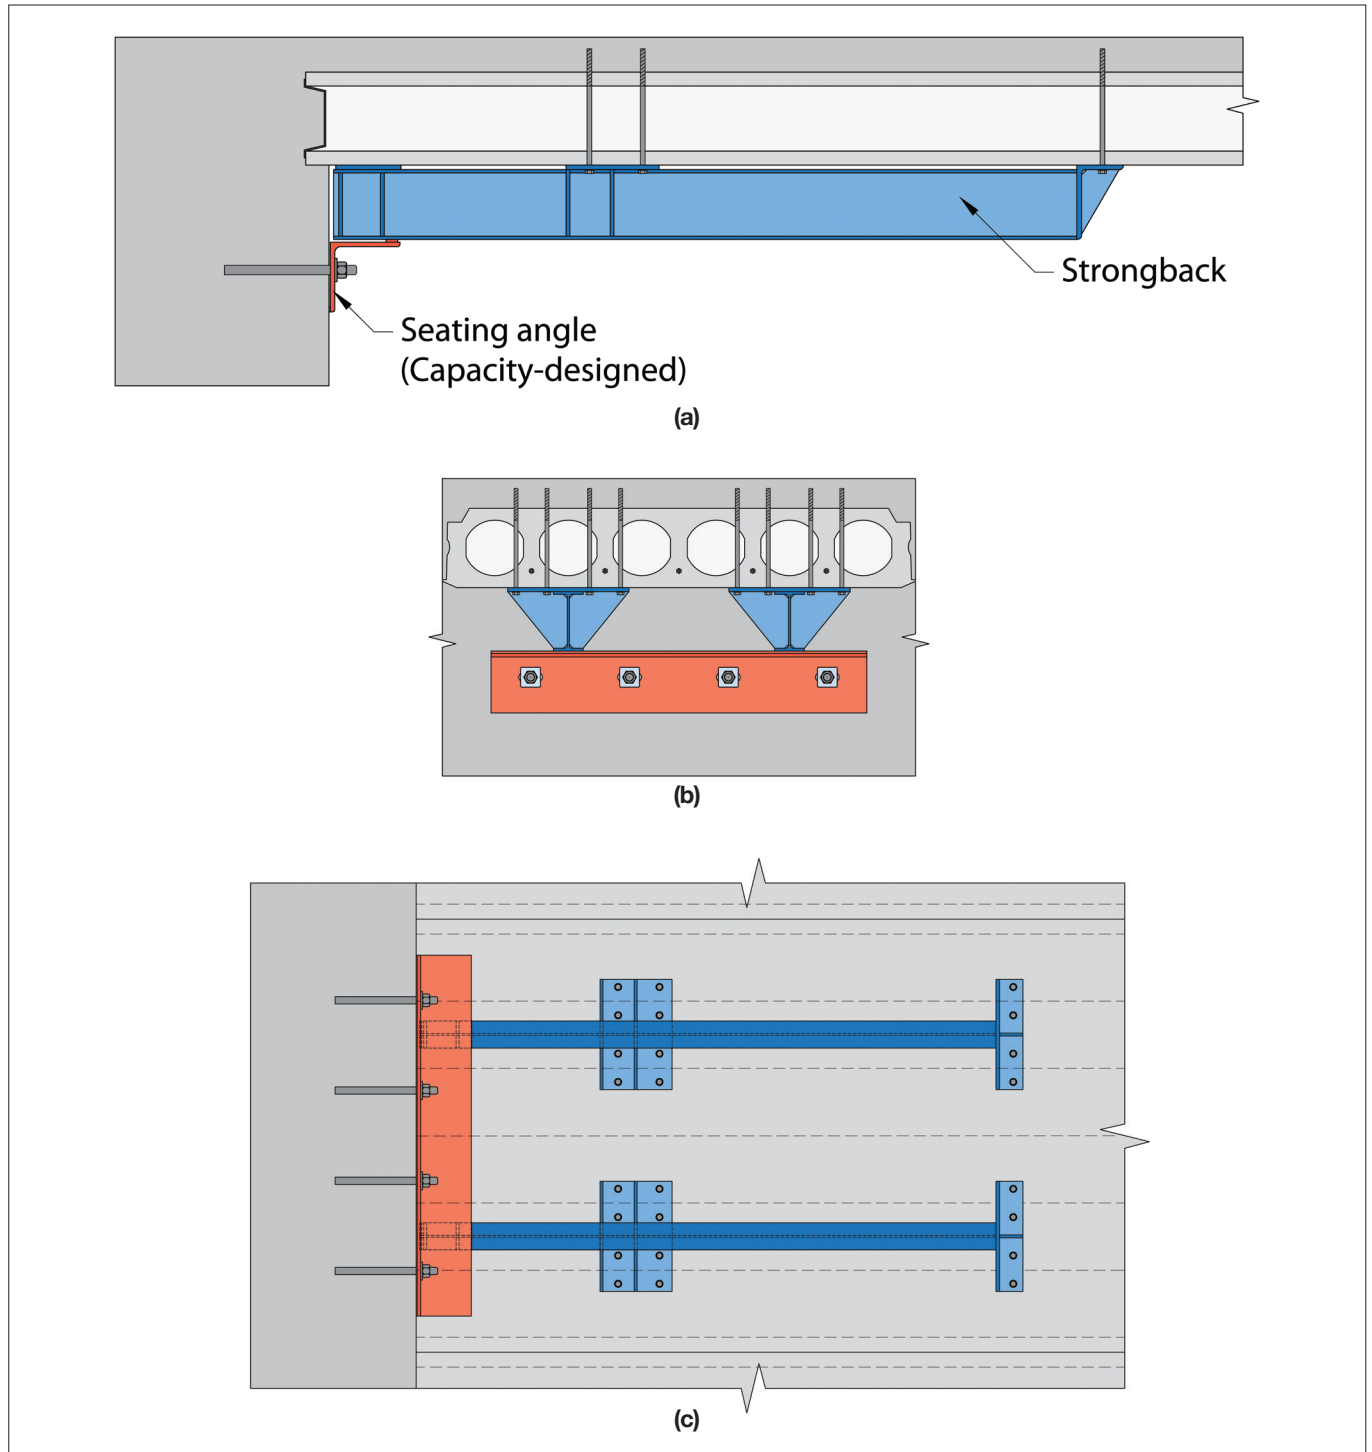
Strongback retrofit showing (a) side elevation, (b) cross section, and (c) plan view of soffit
